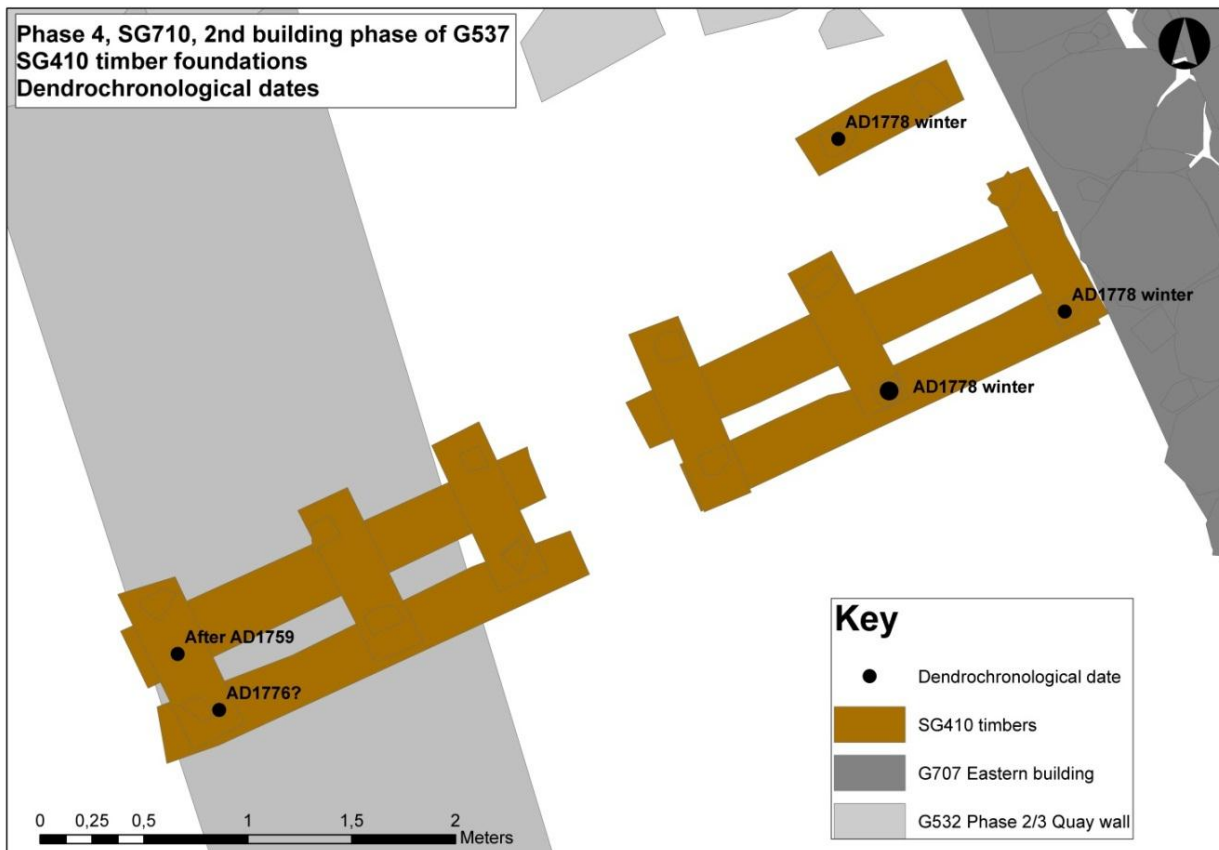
Plan of parts of the possible Vragerbros building (G537). Timber groups relating to the second construction phase of the building.
